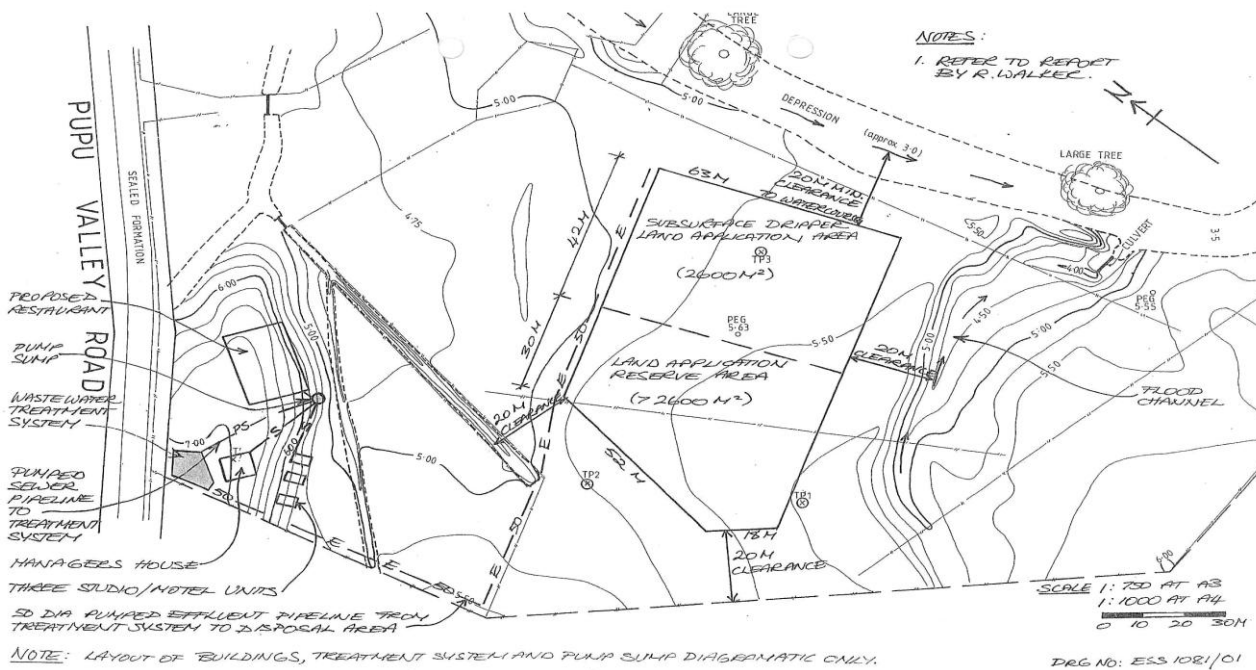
SITE PLAN OF ONSITE WASTEWATER SYSTEM FOR PUPU SPRINGS CAFE
